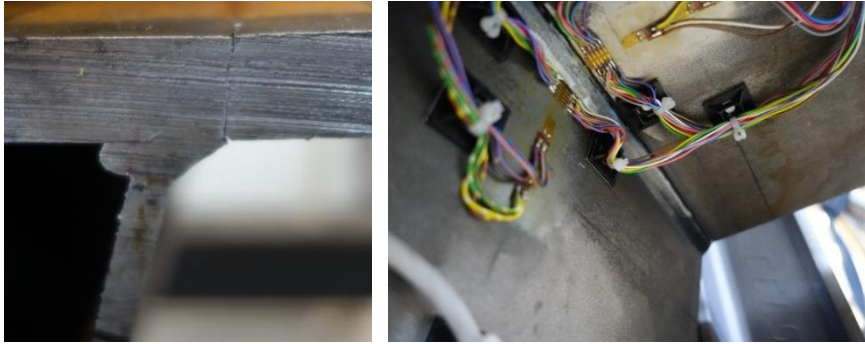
Weld toe crack through the deck plate (Specimen 9)
